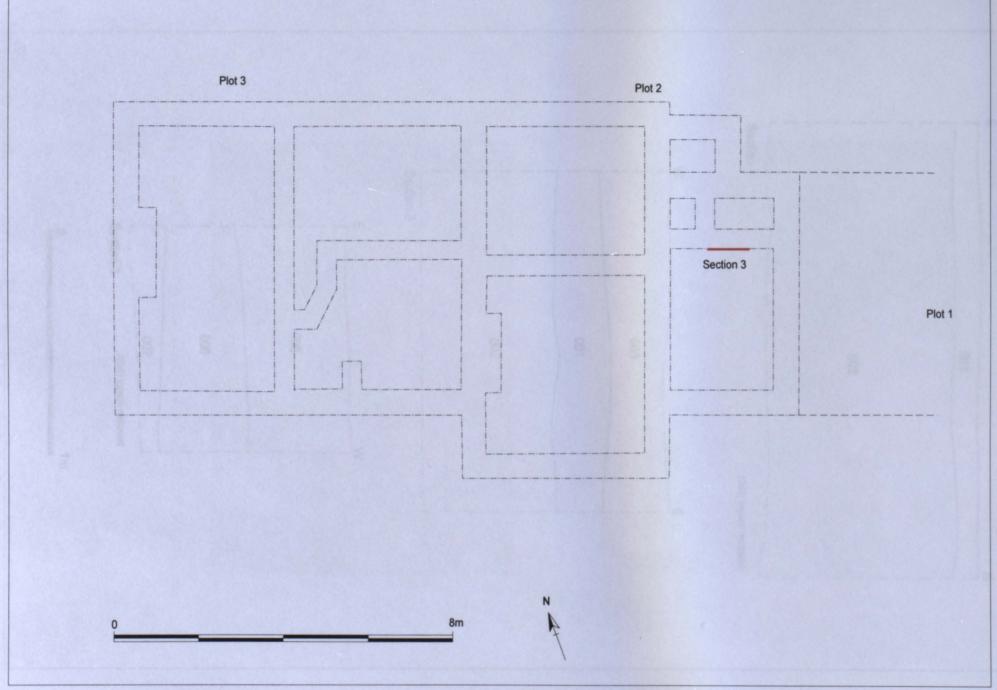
Foundation plan of Plot 2 showing location of Section 3
